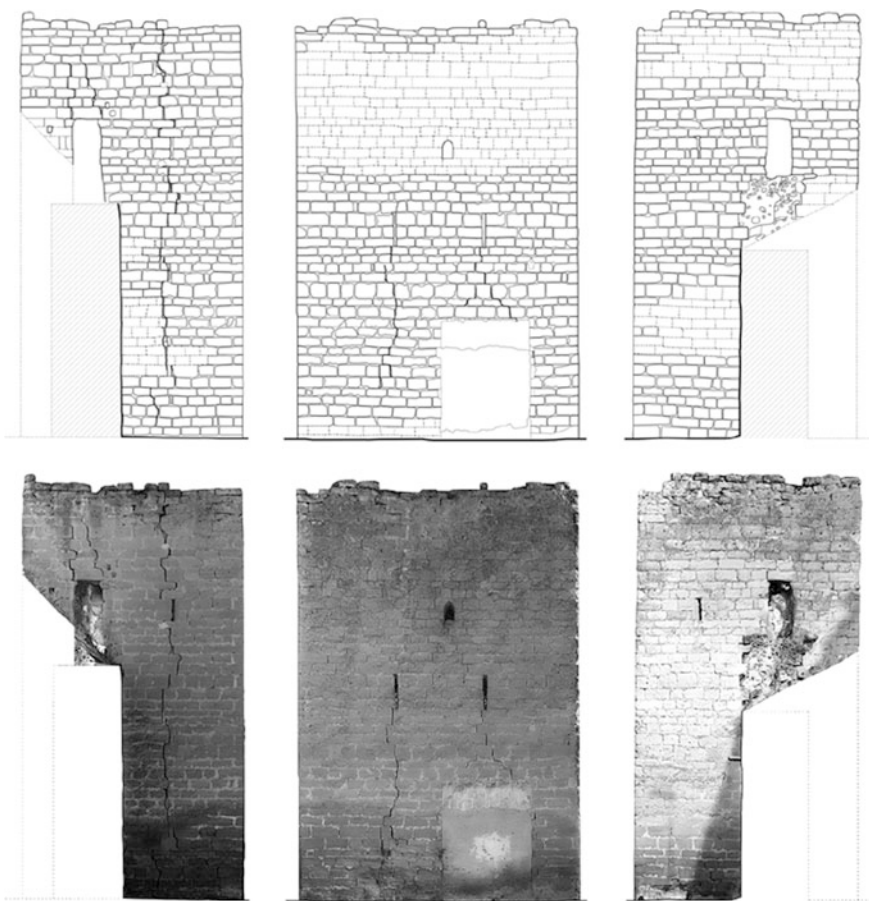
and 8 Plan, elevation and section of one sector of the walls
